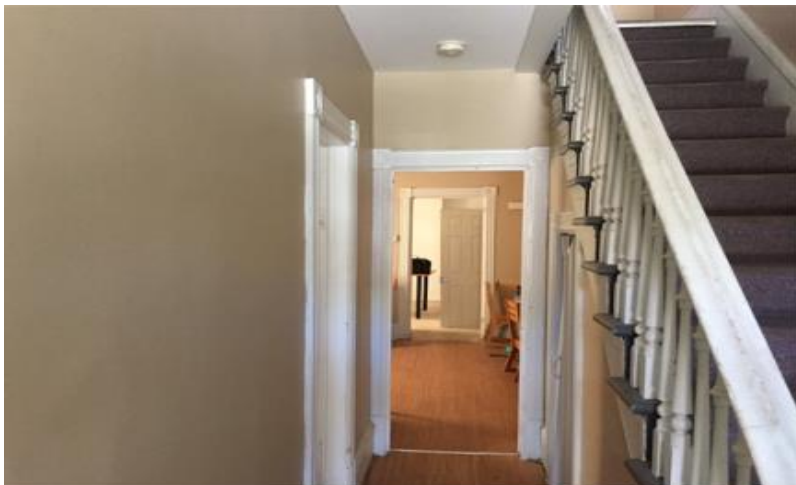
View of typical finishes observed at the building located at 120 Henderson Avenue.
